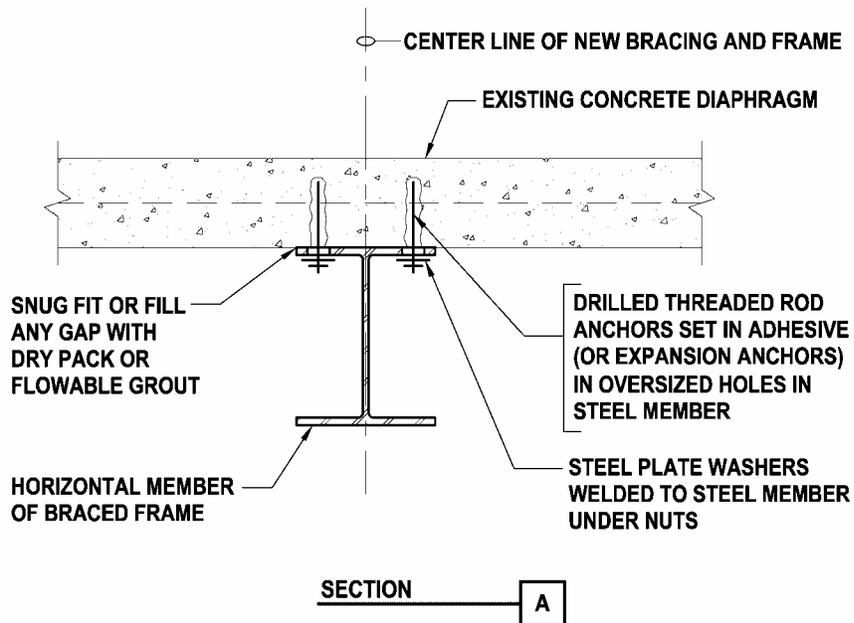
A: Typical Connection to Concrete Diaphragm
